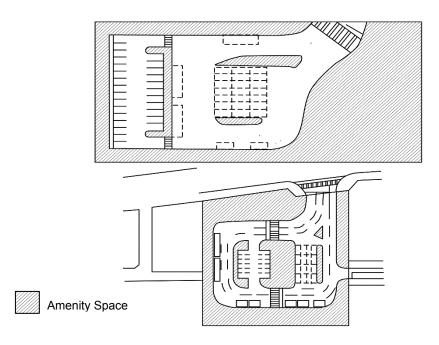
Basic Layout Plan of Intermodal Facilities in Suburban Station
